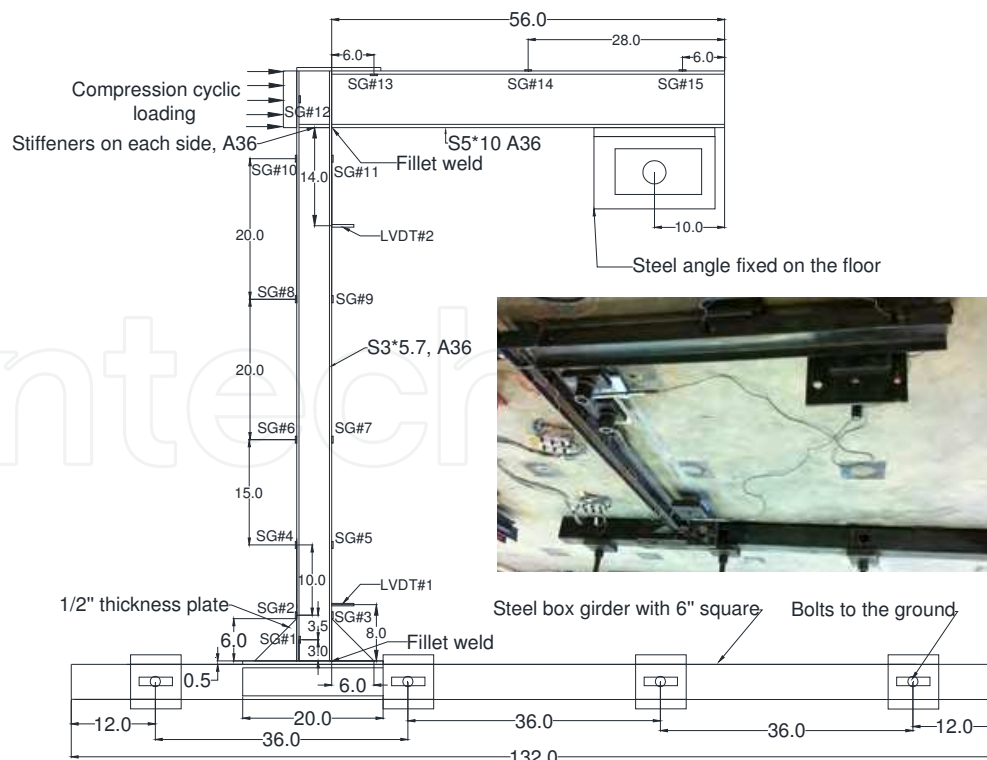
Test setup and instrumentation of the L-shaped steel frame with a prototype inset (unit: in.)
